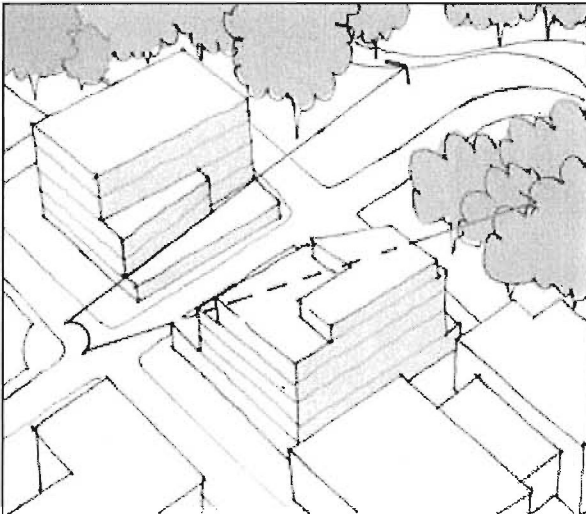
d.3.b step buildings back to enhance views from public spaces
